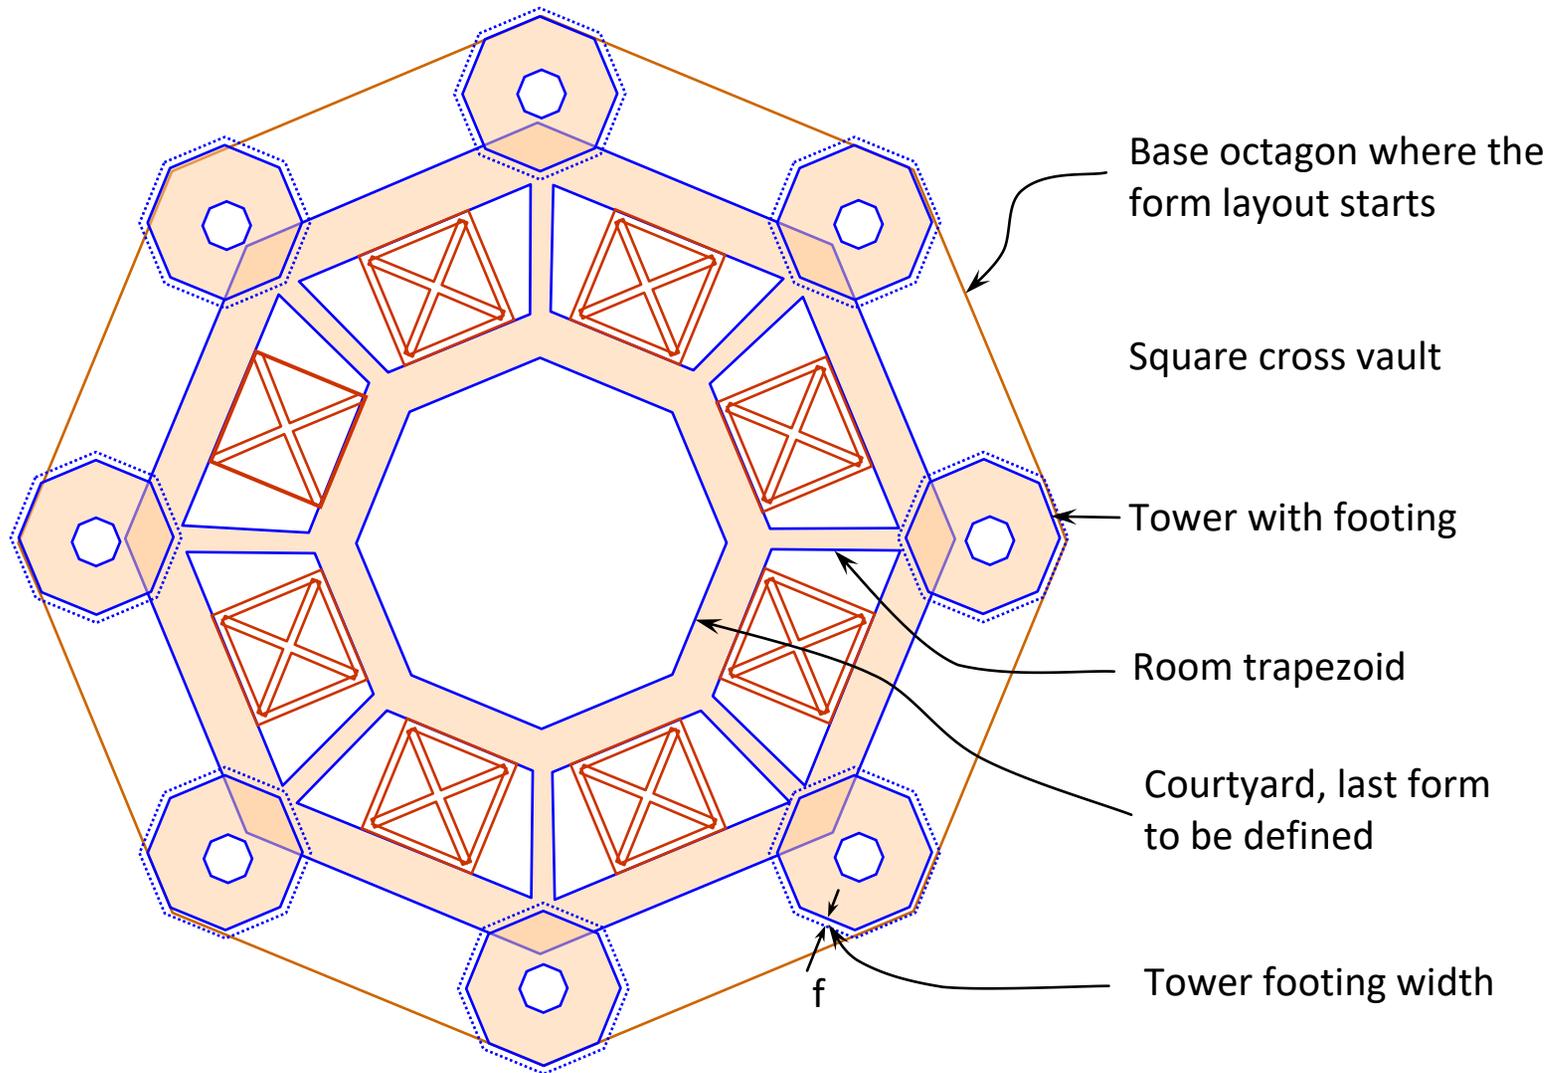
Basic Plant Layout per the New Geometric Design Plan
